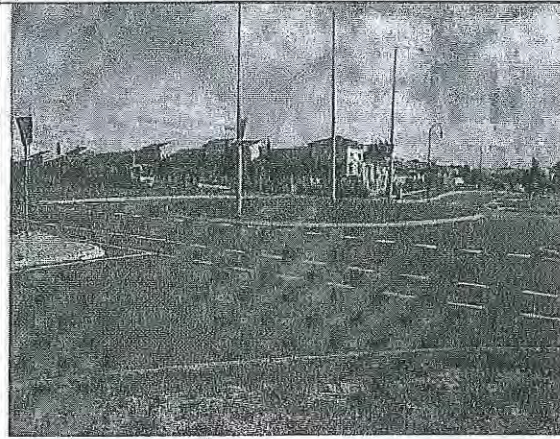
Kate Crace Street going towards north. An arrow indicates patches of dirt road along Kate Crace Street. Note that open grassland area to the right of photograph.
